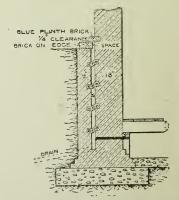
Dry Area with Blue Plinth Brick t cover Cavity.
